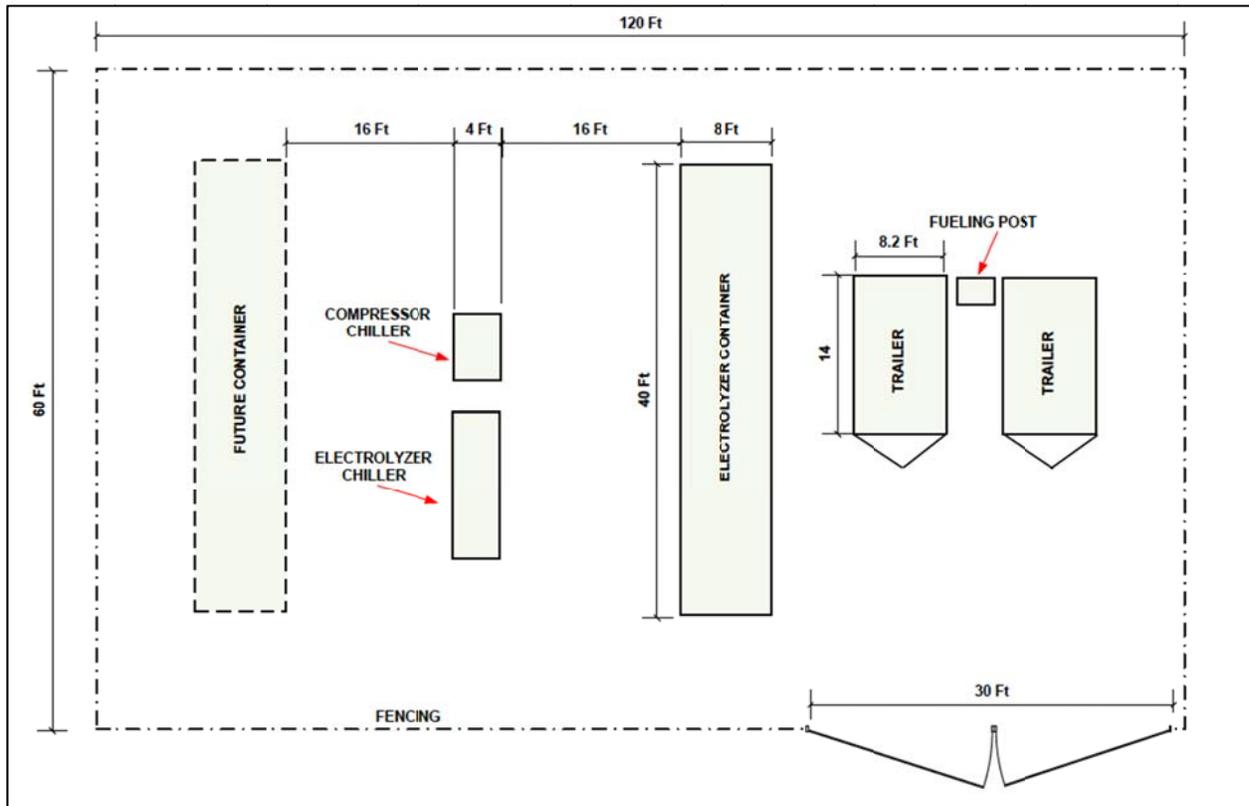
Conceptual Site Plan – Hilo MTA Site
